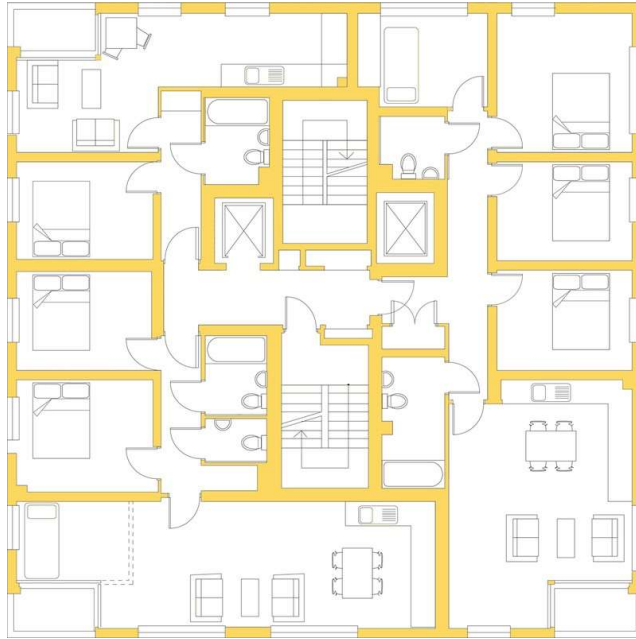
Murray Grove Tower in London - layout (waughthistleton.com)
